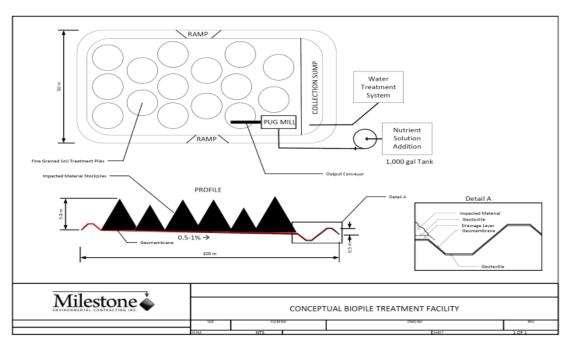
PROPOSED GREENWICH SITE LAYOUT
